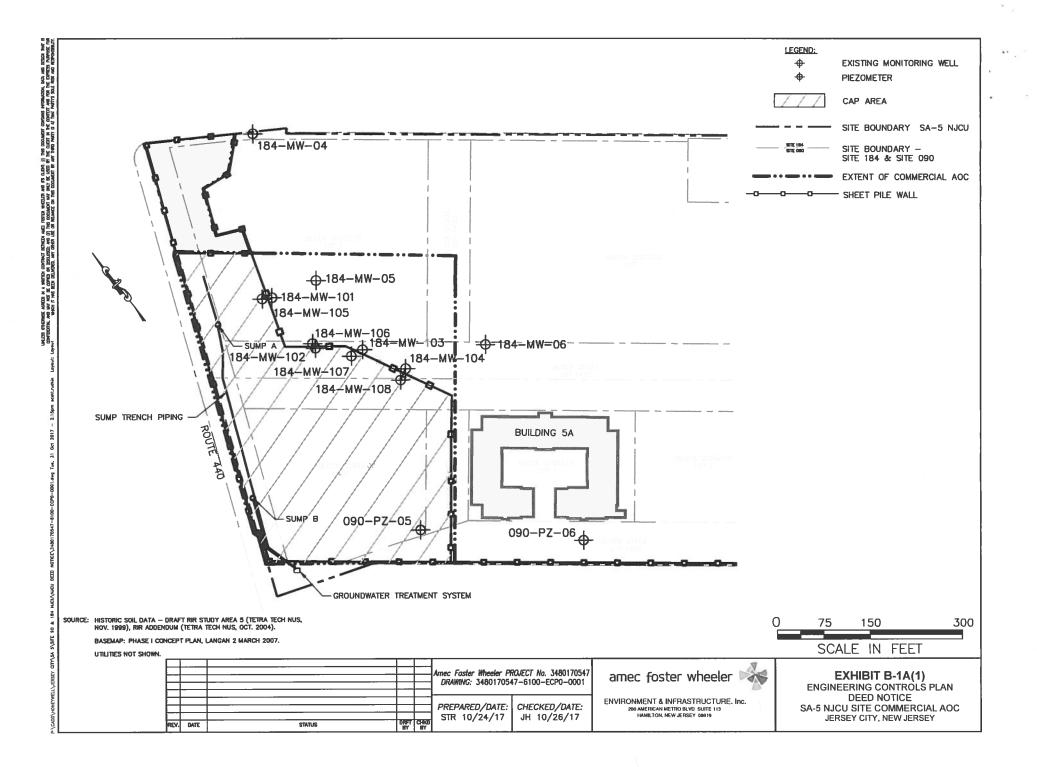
A(1) and (2) also indicate engineering controls for shallow groundwater. The shallow groundwater engineering controls include underground barrier walls and a system of wells, pumps and piping for the collection and treatment of shallow groundwater from the NJCU Commercial AOC.
